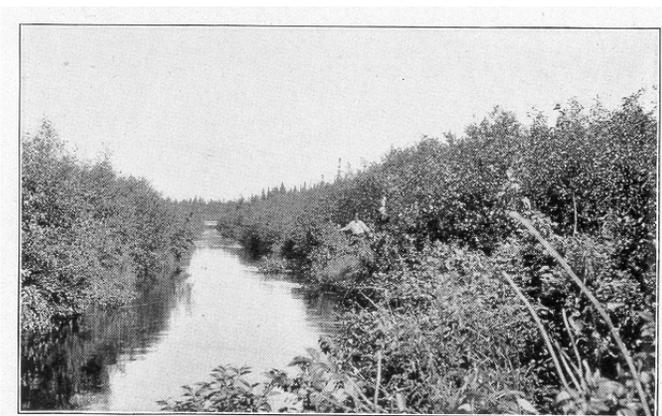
Dredged drain which has poor outlet.
